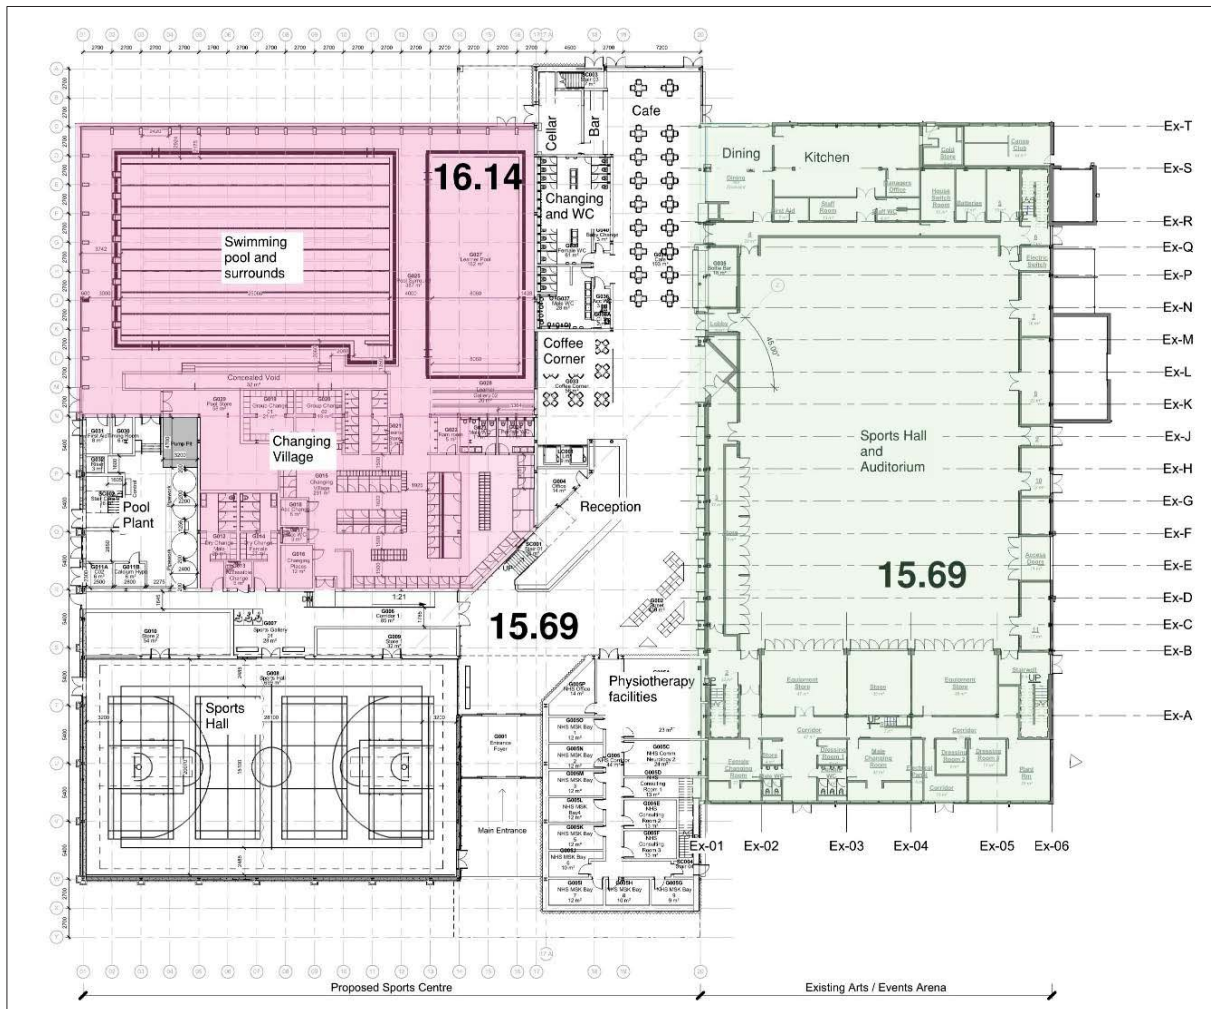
4 Proposed ground floor layout showing levels and area uses (Drawing 17024-GT3-00-GF-DR-A-08-0001-S2-P01 revision P01 provided by GT3 Architects)
